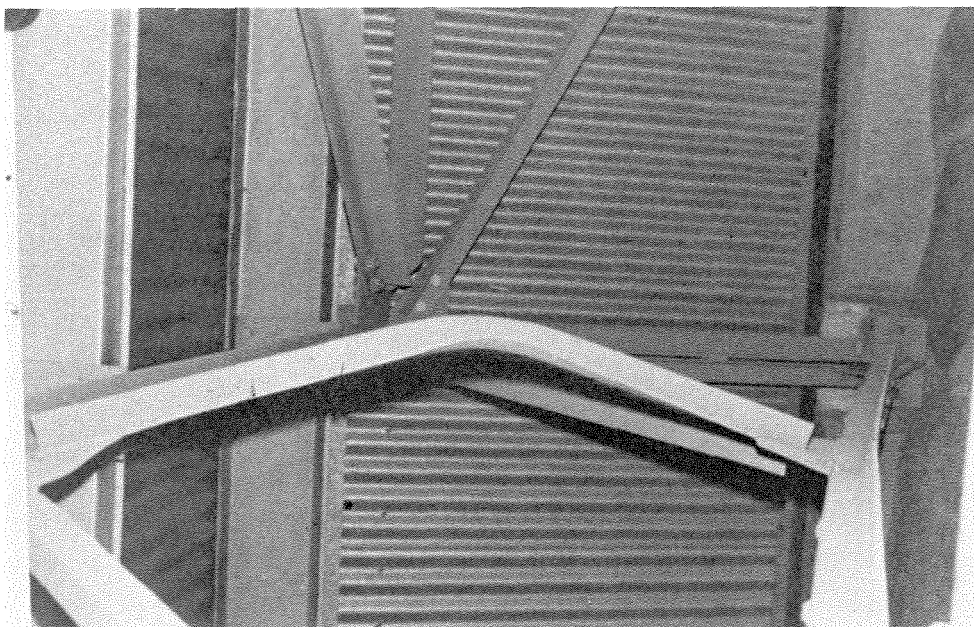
Distorted roof trusses, Co-operative Bulk Handling grain storage facility (GSWA 18765)
